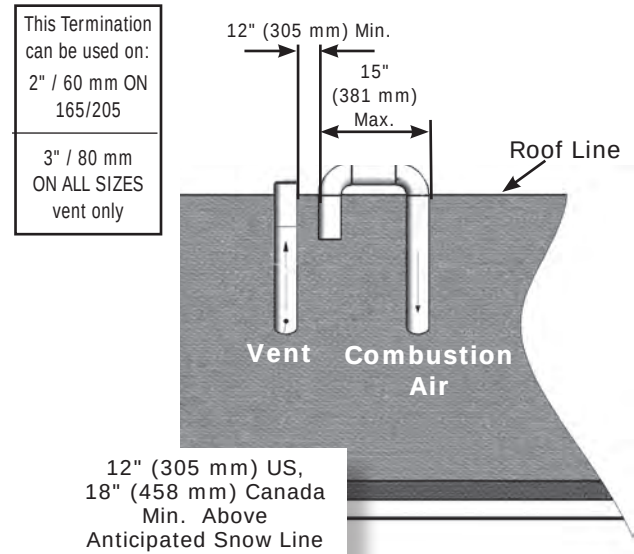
(3" / 80 mm ONLY) Single Wall Exhaust Kit and Air Intake Minimum Distance Center to Center
